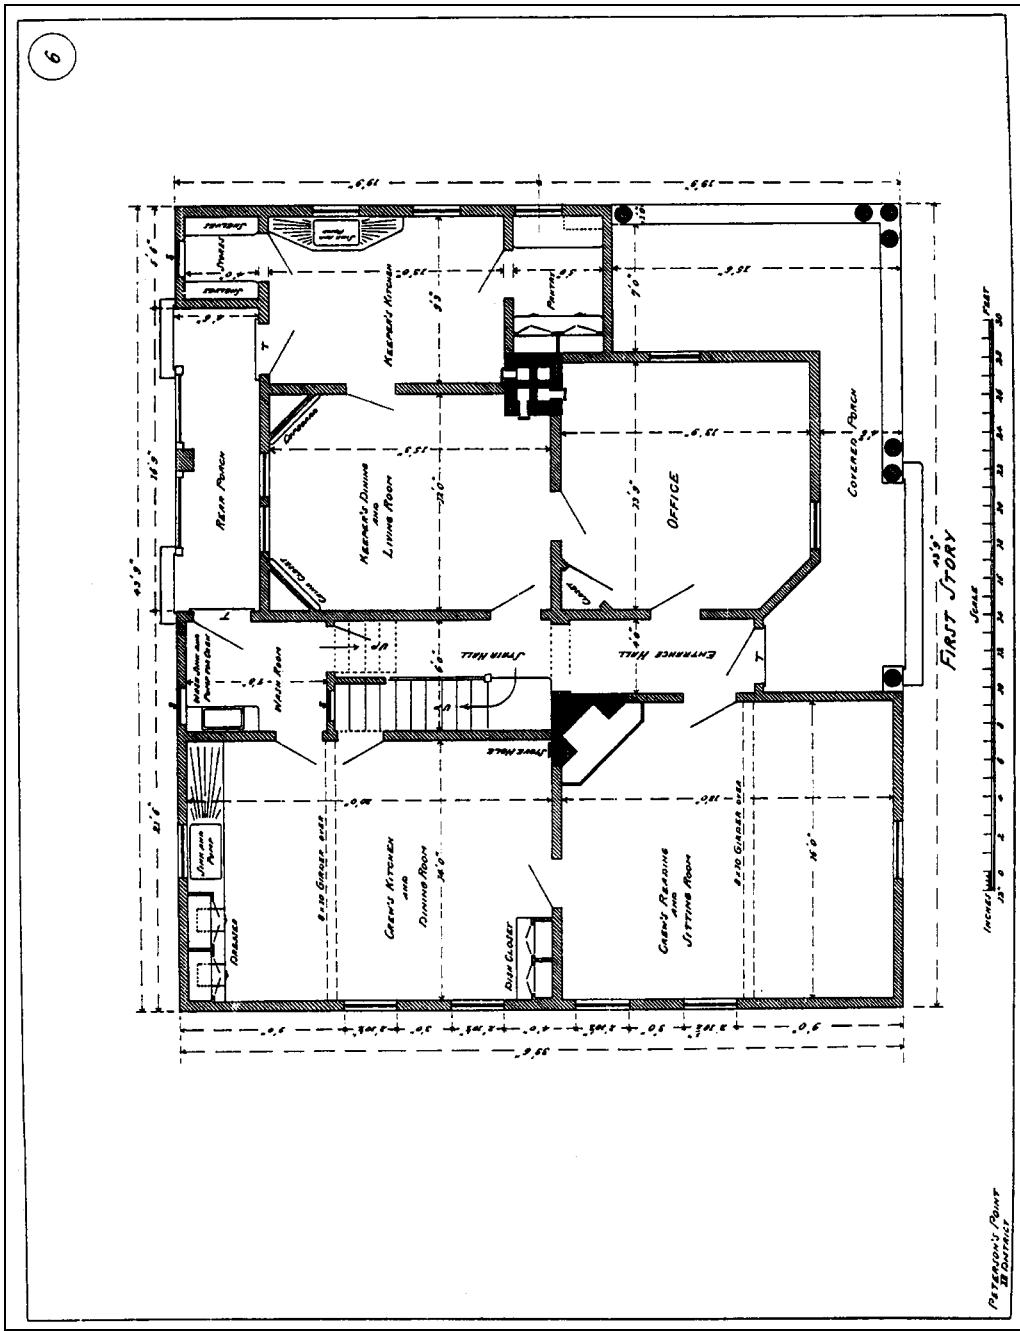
First Floor Plan, Tillamook Bay Life-Saving Station. Source: Nautical Research Centre (#424).
